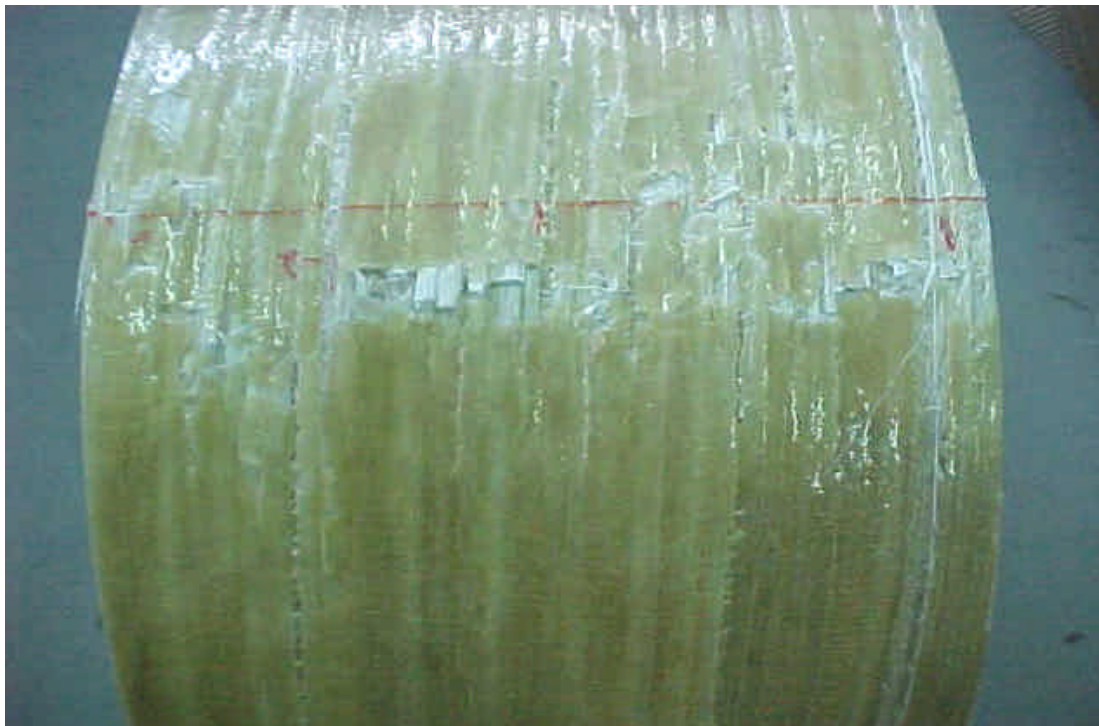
Test piece 5. Buckling of pipe wall around upper bar
